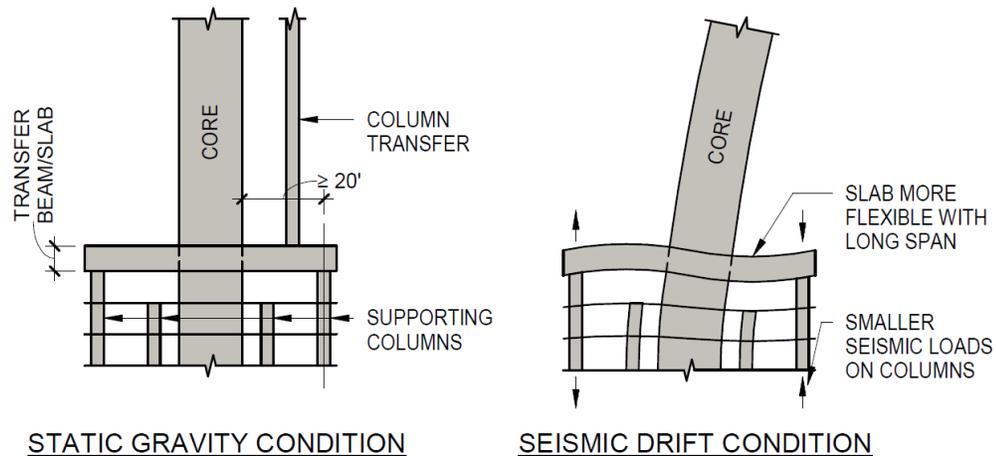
SCHEMATIC SECTIONS AT TRANSFER BEAM/ SLAB CONDITION
